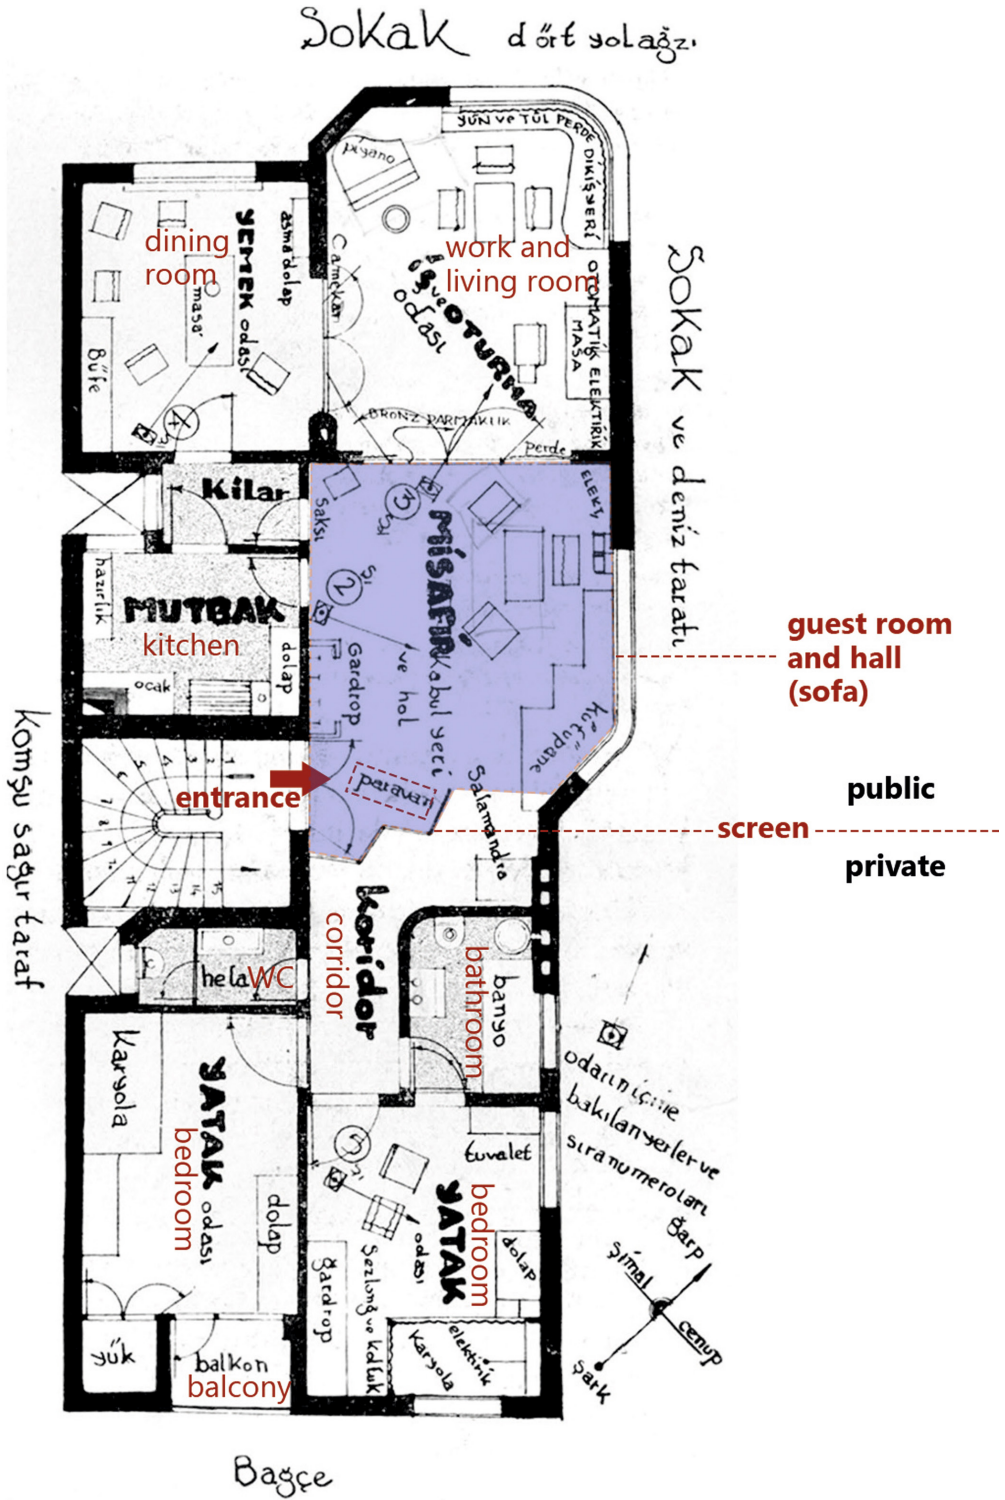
Drawing of an ideal apartment floor plan by Aptullah Ziya, detailing and annotating the optimal layout and design features. (Source: Ziya, 1931).
